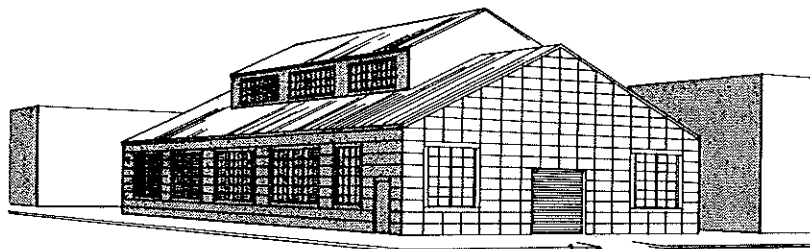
Perspective of factory. Walls of masonry, concrete, or metal panels over masonry. Wall footings are reinforced concrete 2'-0" wide and 12" deep. Column footings are 3'-0" square and 15" deep. The gable end may have truck doors on each side with a large window in the middle. The monitor on top of the building may be extended the full length, or be omitted. See Fig. 22.48 for steel framing.
